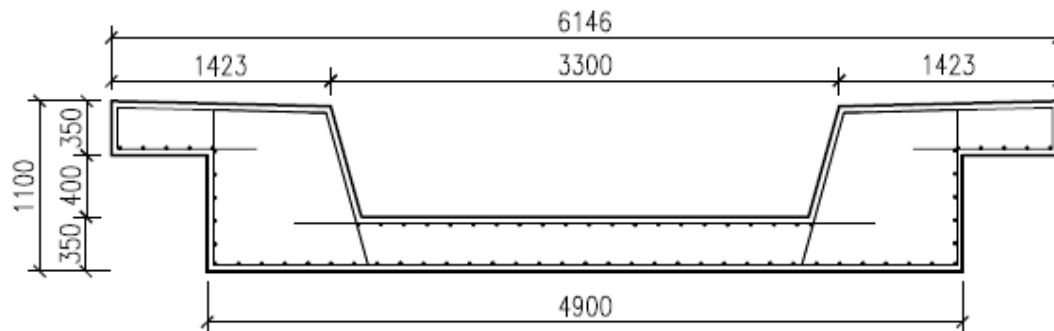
Cross-section of the bridge deck (Elfgren et. al., 2007)
